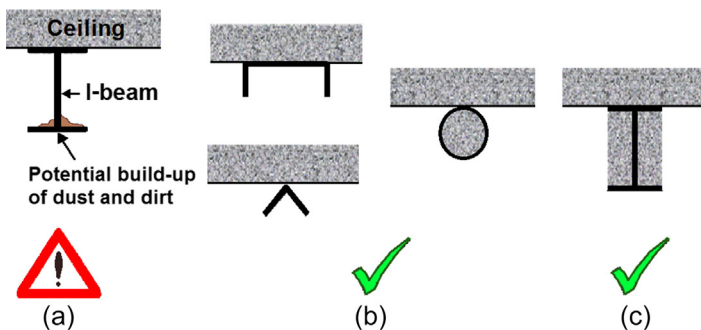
(a) Unhygienic steel structure, and hygienic steel structures in (b) low and (c) medium hygiene areas. Beams supporting the ceiling should not have horizontal ledges upon which dirt and dust may settle. Eventually fill the steel profiles, as exposed steel still may corrode (Holah et al., 2014).
